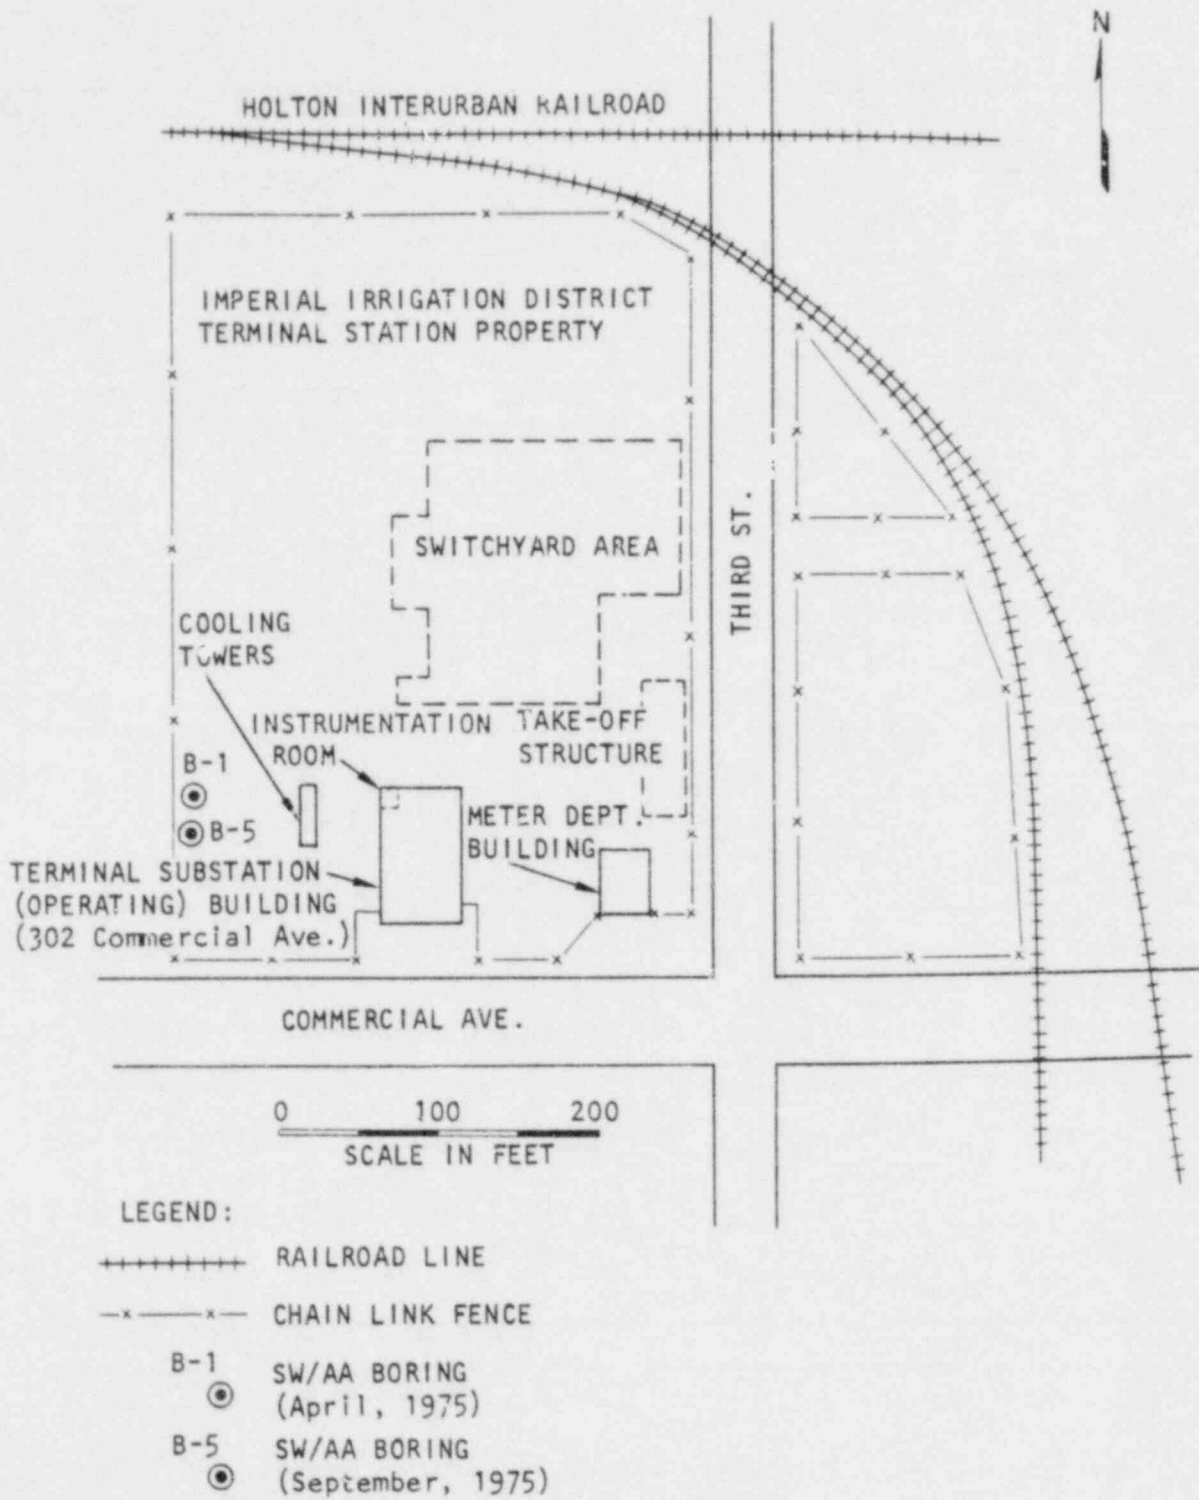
SITE PLAN AND SW/AA BORING LOCATIONS AT EL CENTRO TERMINAL SUBSTATION (SW/AA, 1976)
